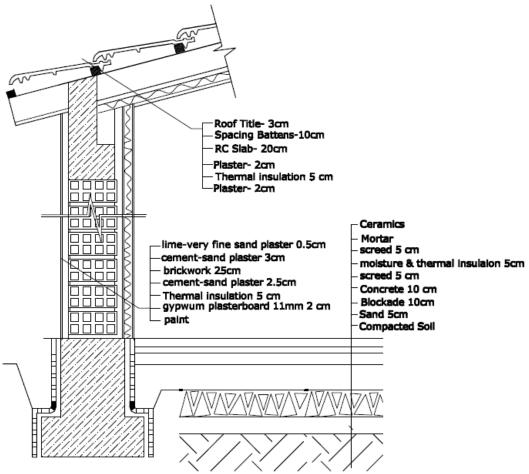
Construction Technique in Contemporary period- Brick wall- C3
